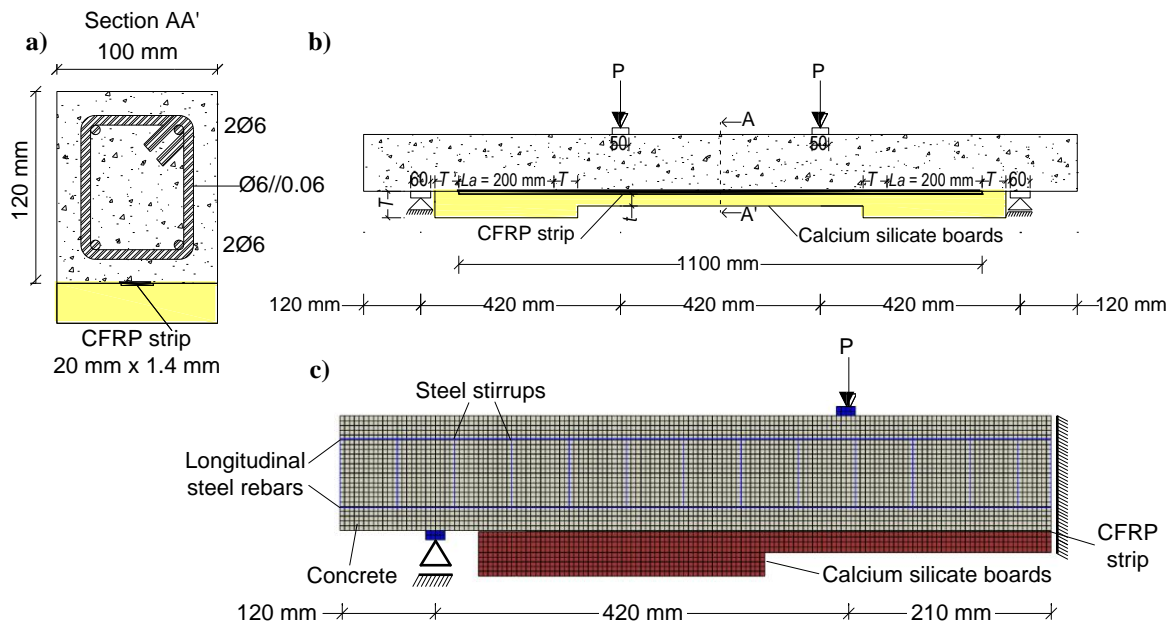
Geometry of the beams: a) midspan cross section; b) longitudinal view of the tested beams; c) FE mesh of the beams' models (example of the model 50-25).
